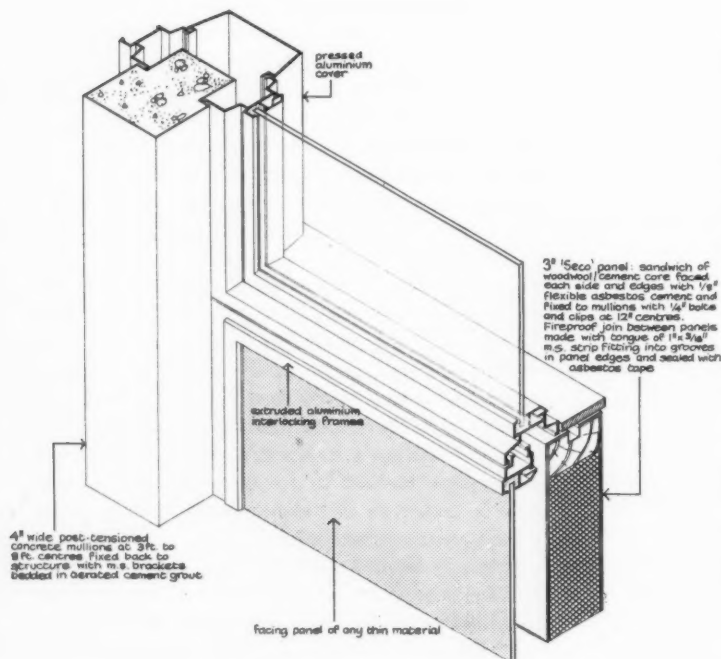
Sheath wall with 2-hour fire resistance (Gardiners Muragard).
